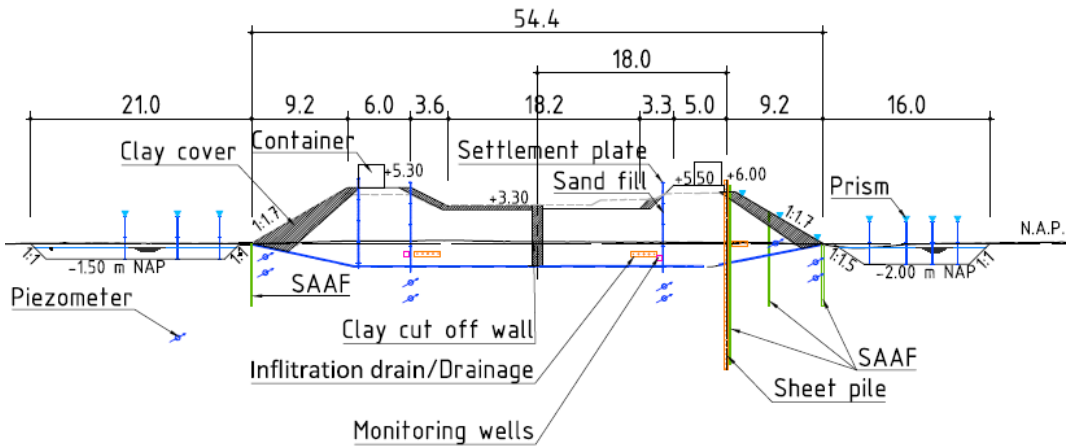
Cross section with on the left side the ground dike and right side sheet pile dike.
